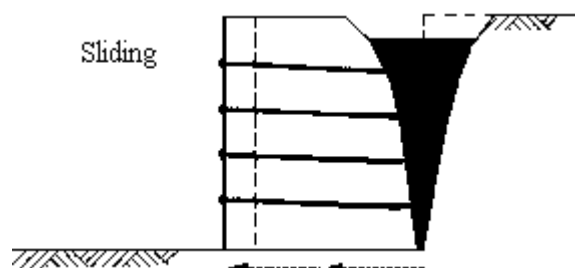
Sliding of the wall on its base (external failure) [20]
